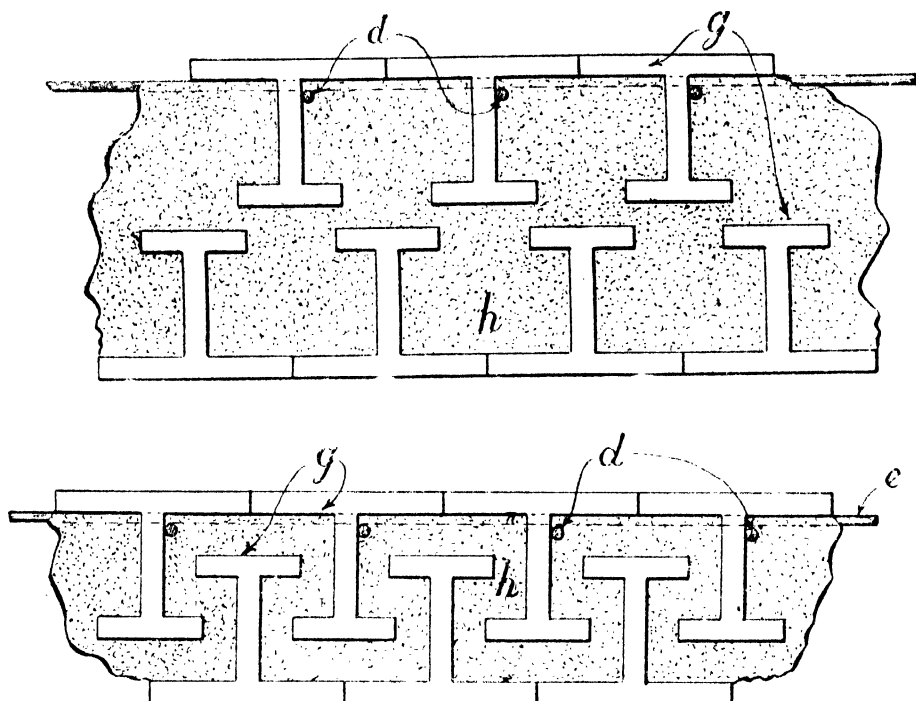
Forms with unequal flanges, suitable for thick walls or when one face only of the wall is required as in retaining walls, etc.
